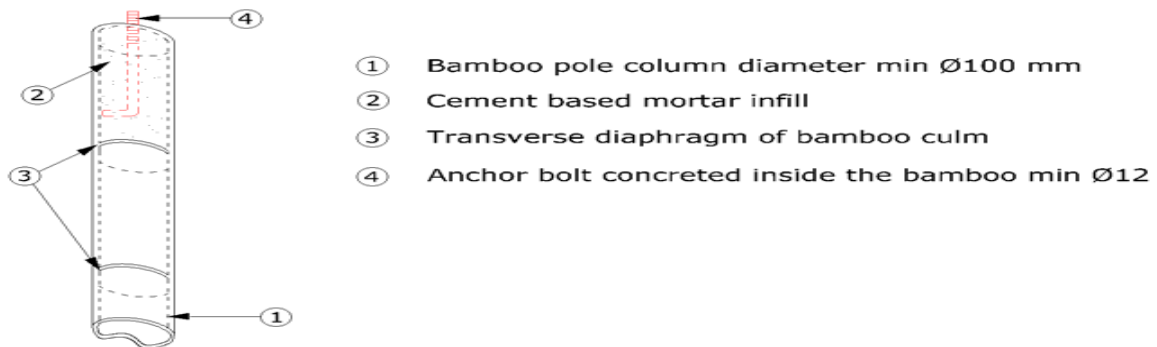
Bamboo pole column is connected to beam through an anchor bolt
